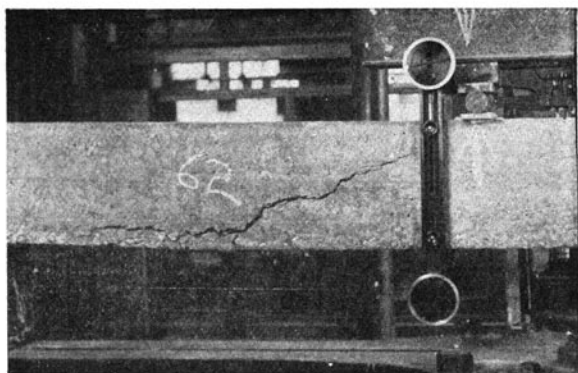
VIEWS SHOWING BEAMS AFTER FAILURE.
